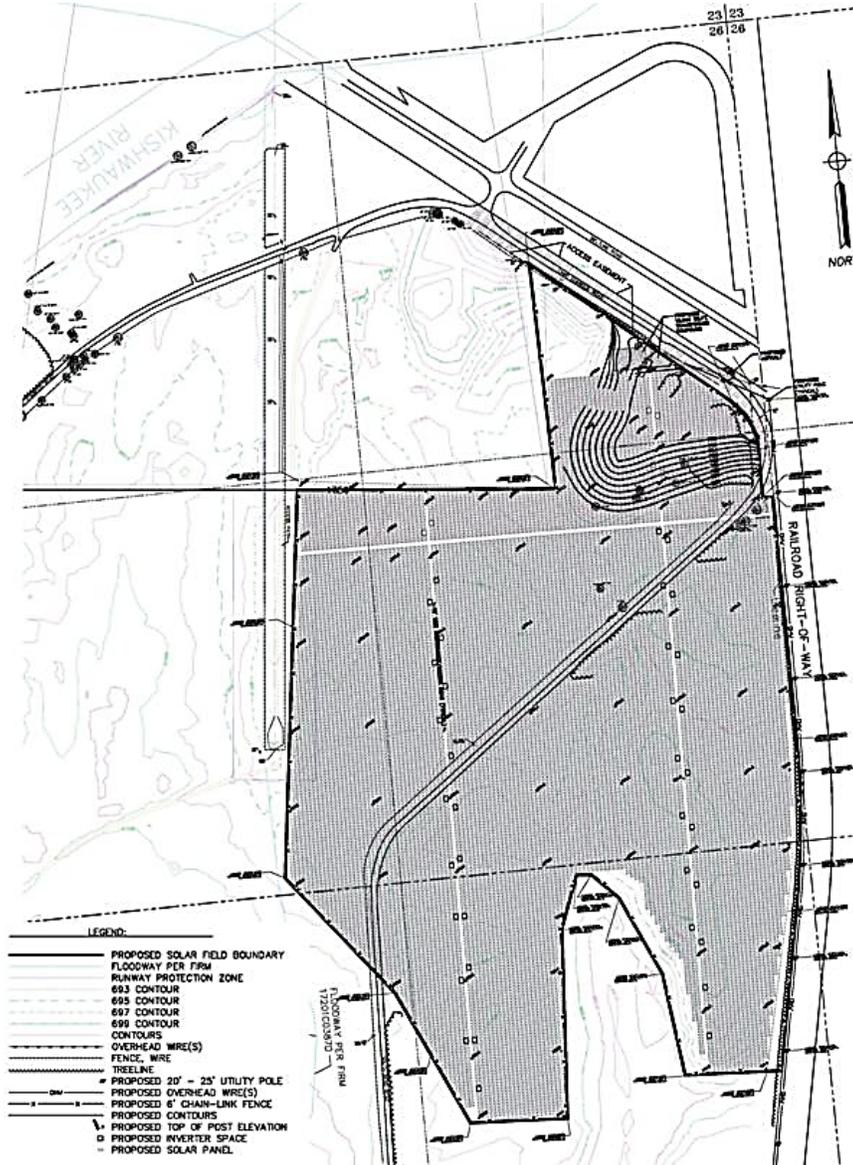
Proposed Solar Farm Site Plan (See Appendix D, for high resolution image)
